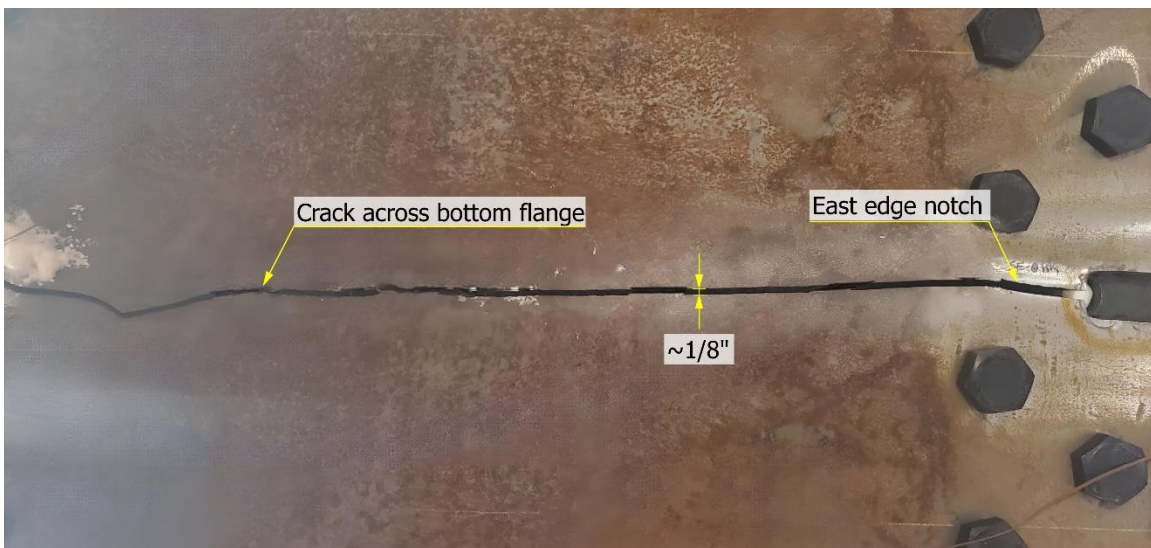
Specimen B1 Ultimate Strength Test: bottom flange crack after reaching the calculated plastic moment of the faulted section and unloading the specimen
